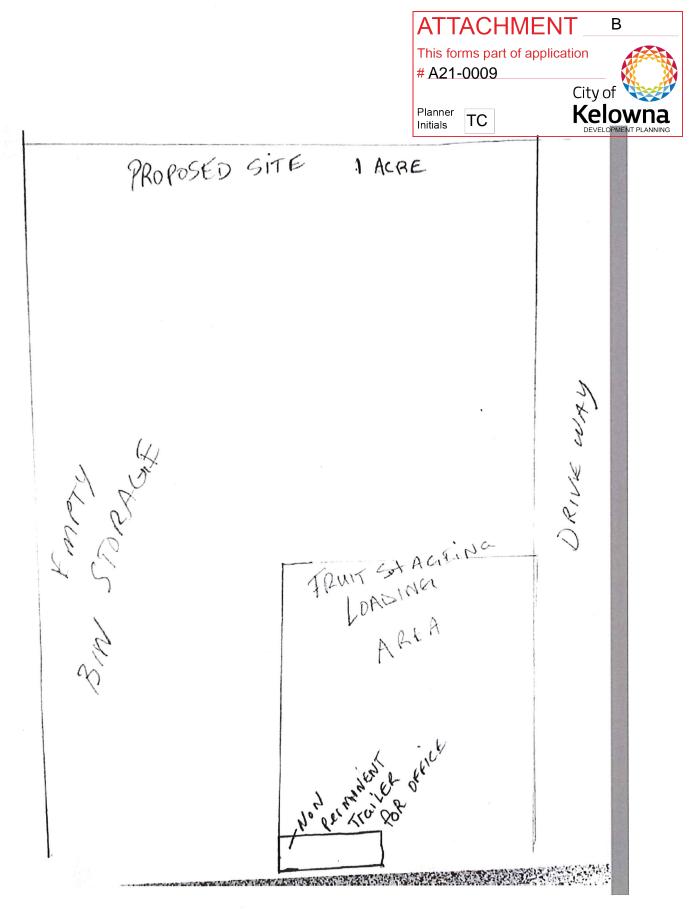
; Site map produced by project proponent showing specific layout of scale shack, loading area and bin storage.
